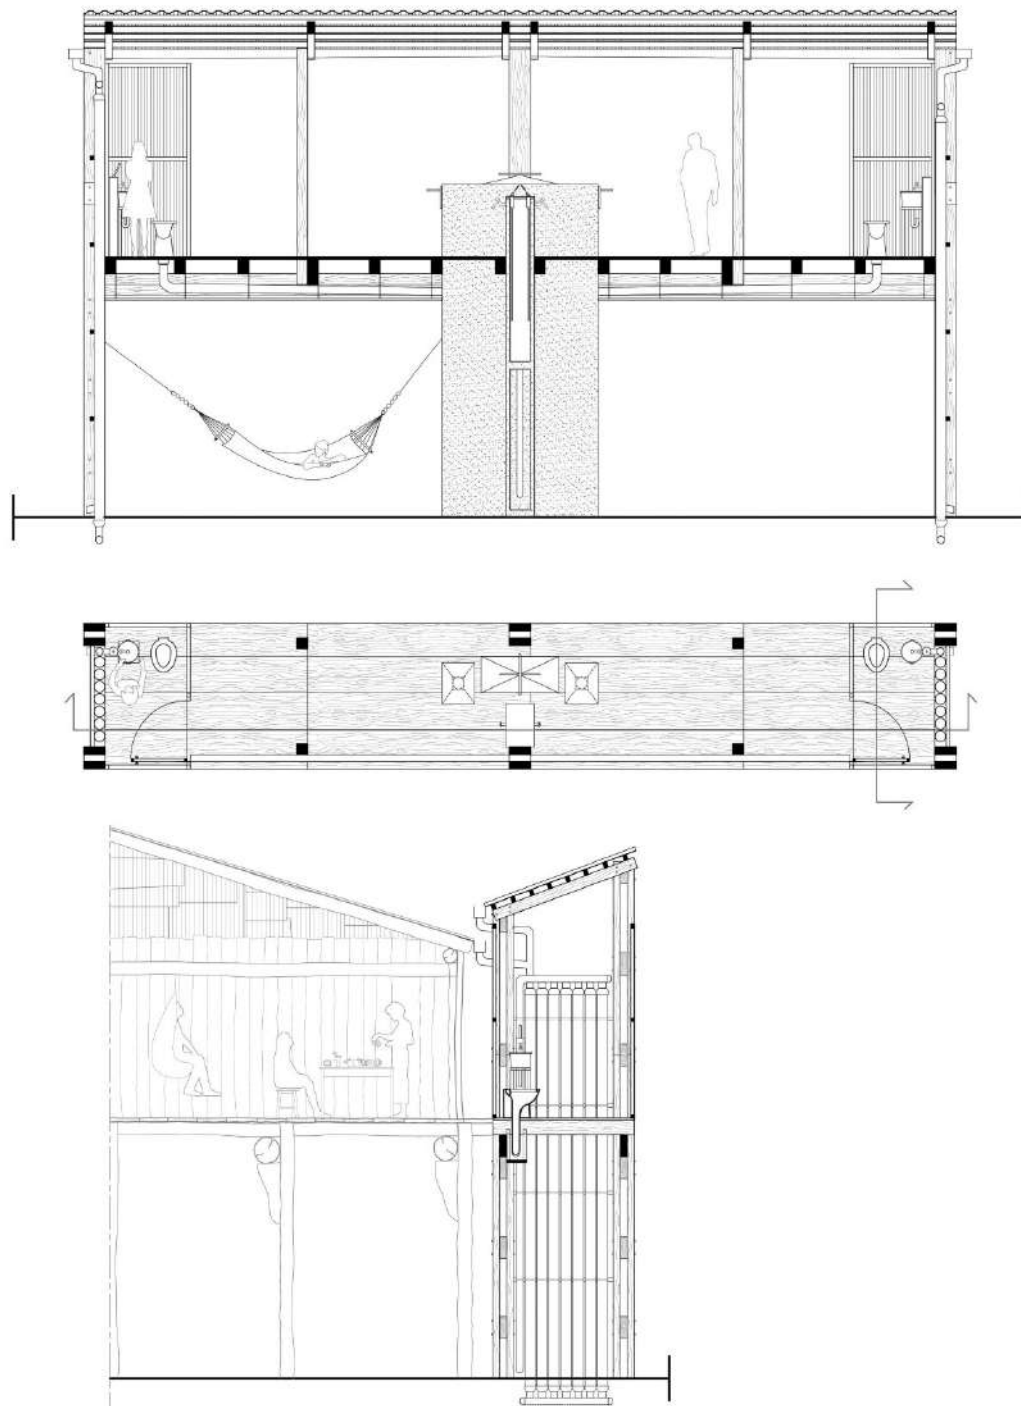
| Module for home use: longitudinal section, plan, and cross-section.
